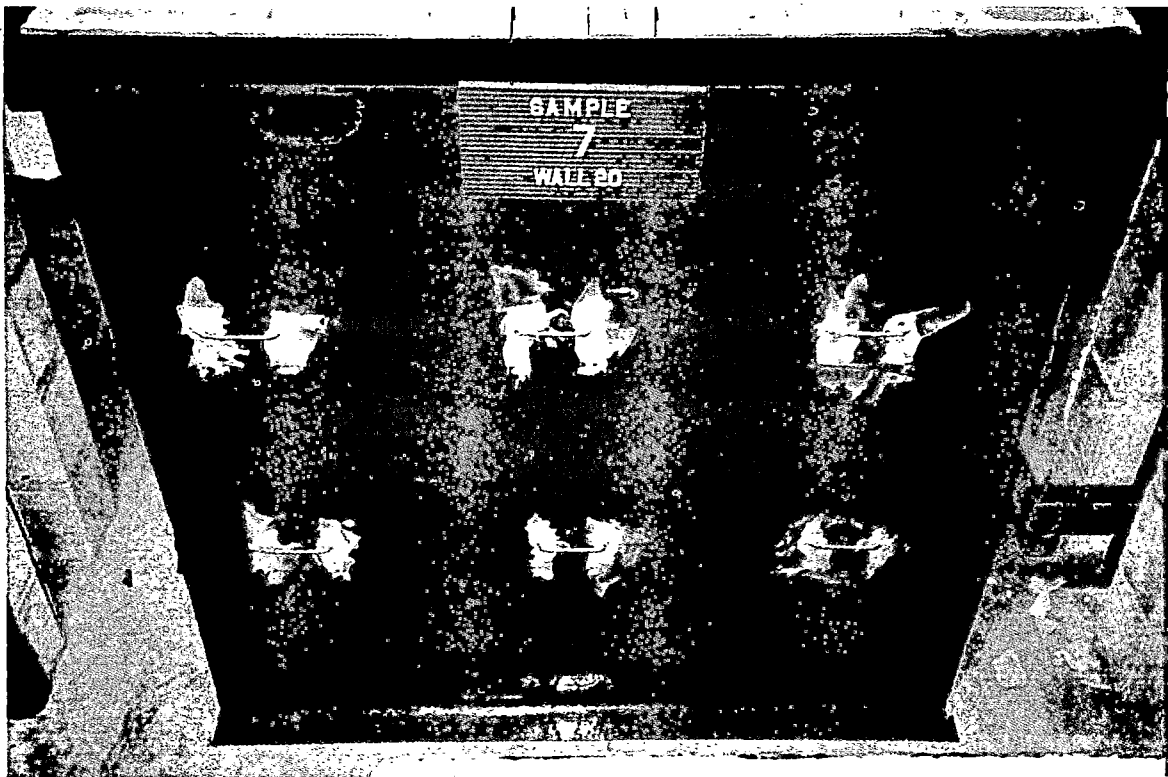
Post Test View of Sample Number 7 on Brick-Tie Wall - Adhesive Applied Air Barrier
